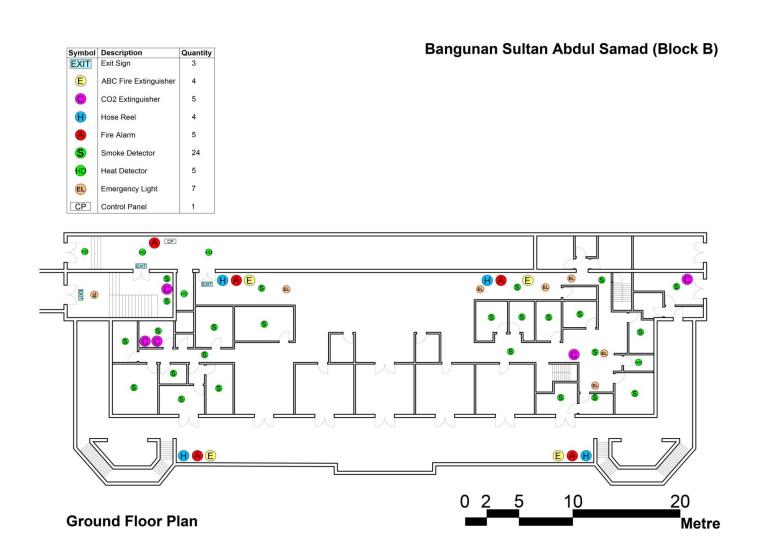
Location of active fire protection measures at Ground Floor Level of Sultan Abdul Samad (Block B)
